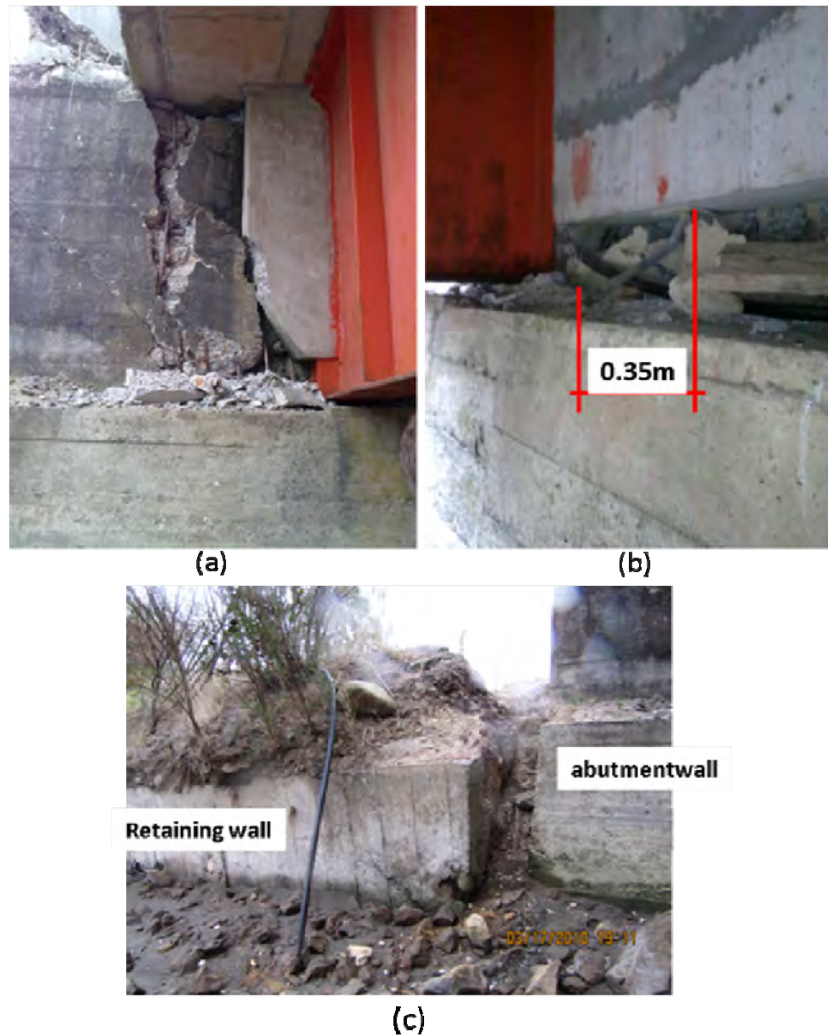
Damage to bridge abutment due to lateral spreading of soil around bridge abutment. (a) abutment wall movement relative to beams, (b) deformation of vertical restraining bar due to abutment movement relative to beams, (c) movement of retaining wall relative to abutment. (S37.254345°, W73.437021°; 1911 hrs on 3/17/2010)
